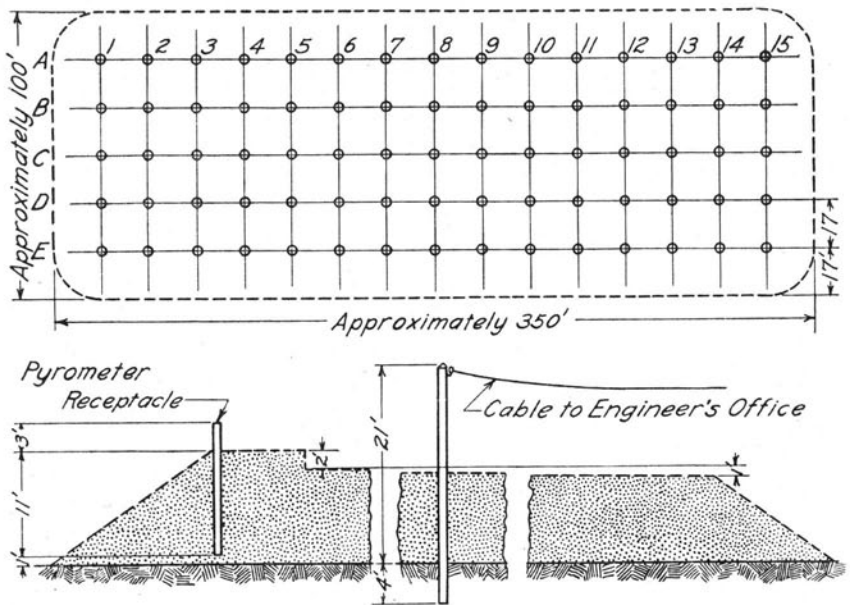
PLAN AND SECTION OF COAL PILE SHOWING ARRANGEMENT OF RECEPTACLES FOR PYROMETERS
